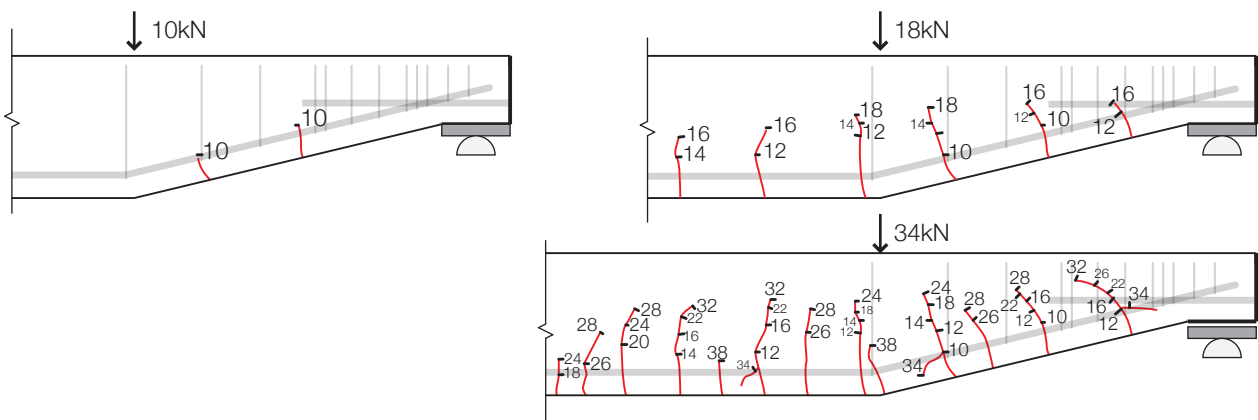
Cracking in Beam 9\_2\_STM\_2(i).
